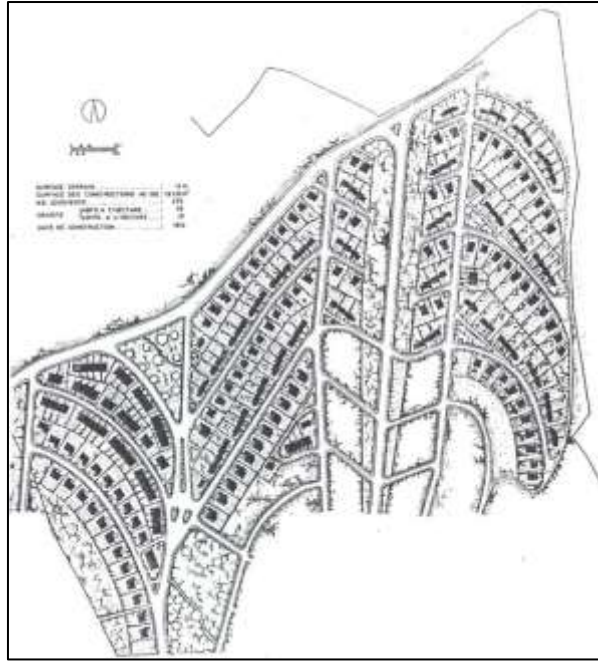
3. Levent Site Plan - (Gayretli, 2016)
